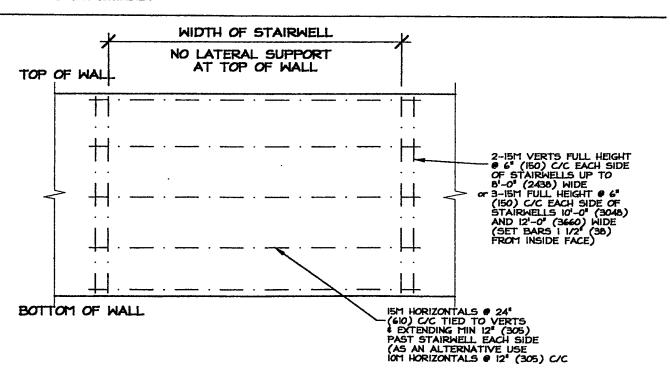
REINFORCEMENT AT STAIRWELLS SEE ALSO NOTES FOR FIGURE 10-4
